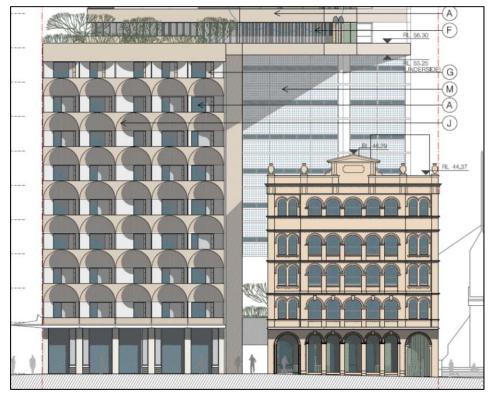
The detailed design of the podium and Porter House (lodged as Stage 2 DA), illustrating the separation between buildings at 3.8 metres
